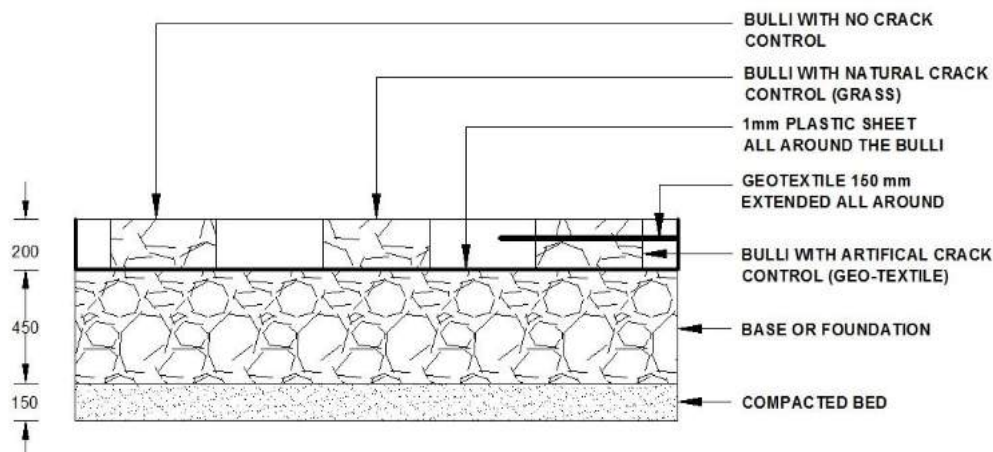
Section A-A of layout plan (all dimensions are in mm)
